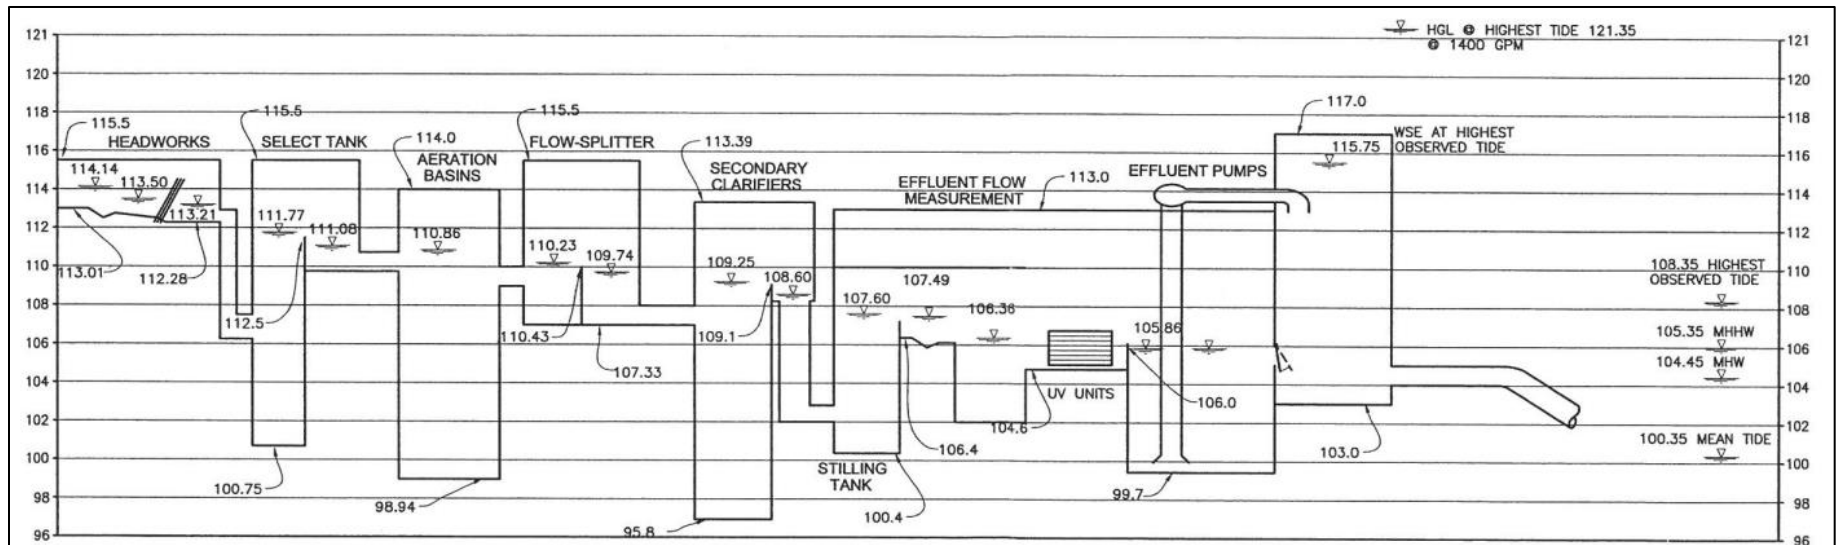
Coupeville Wastewater Treatment Plant Hydraulic Profile
